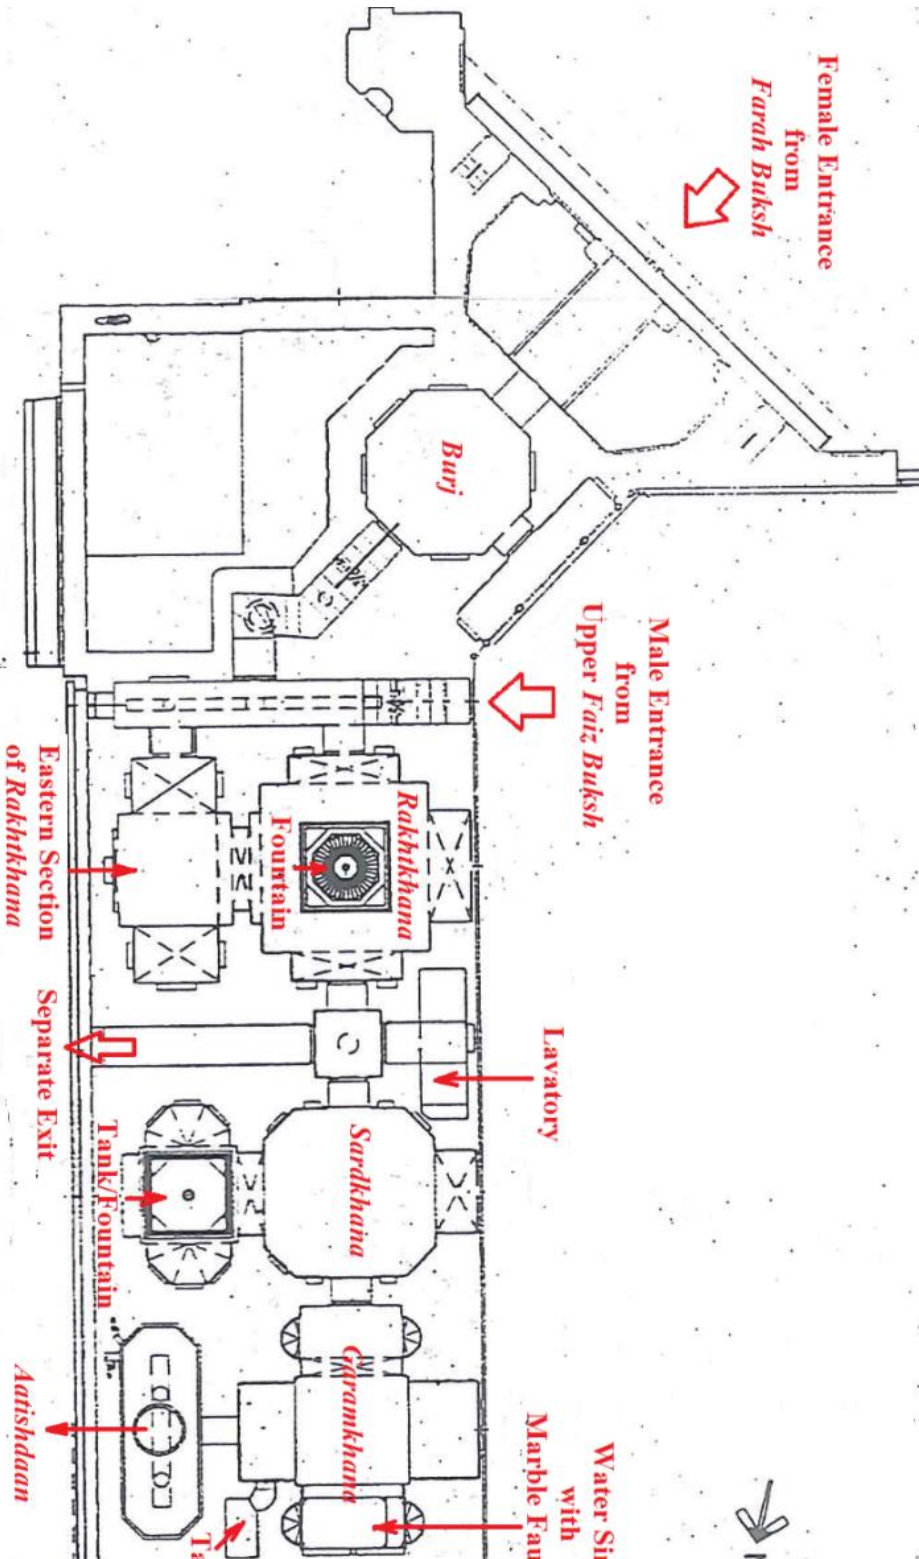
Plan Showing Different Rooms of Shahi Hammam
